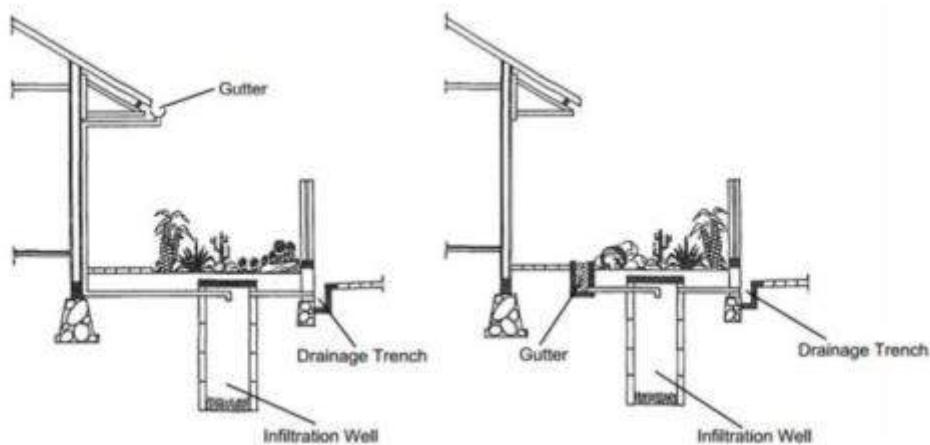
Design of infiltration wells using gutters on the roof and gutters on drainage.
